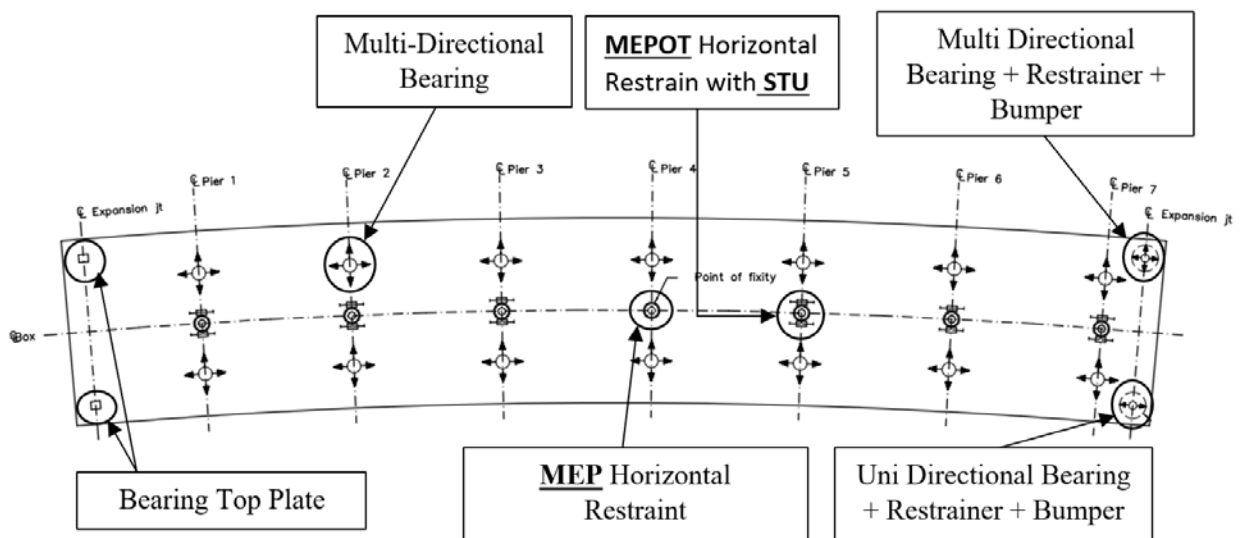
Bearing layout in 7 Span modules of The Bangabandhu multipurpose bridge
